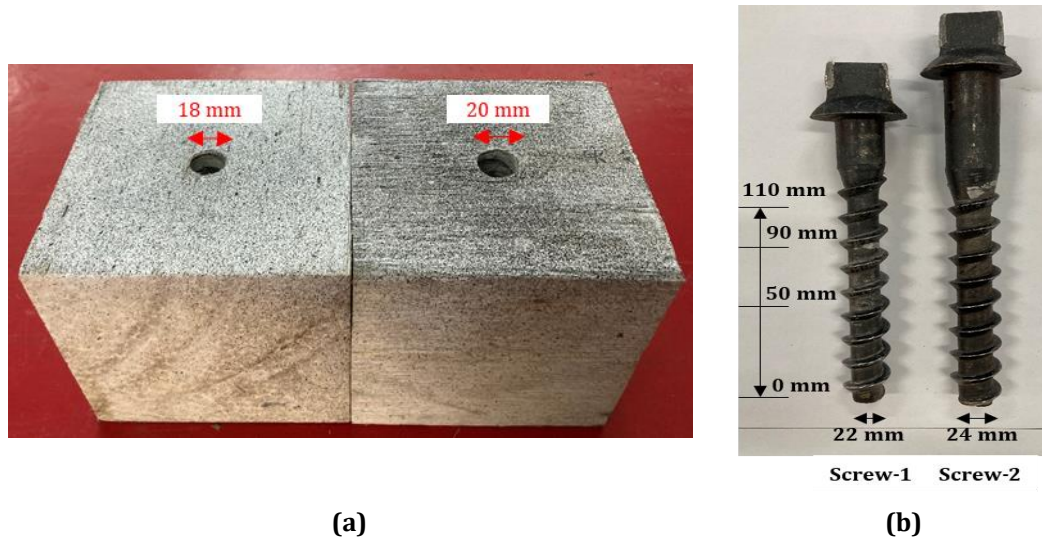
An overview of (a) FFU specimens hole diameter and (b) screws length and diameter used in pull-out test of fastening system.
